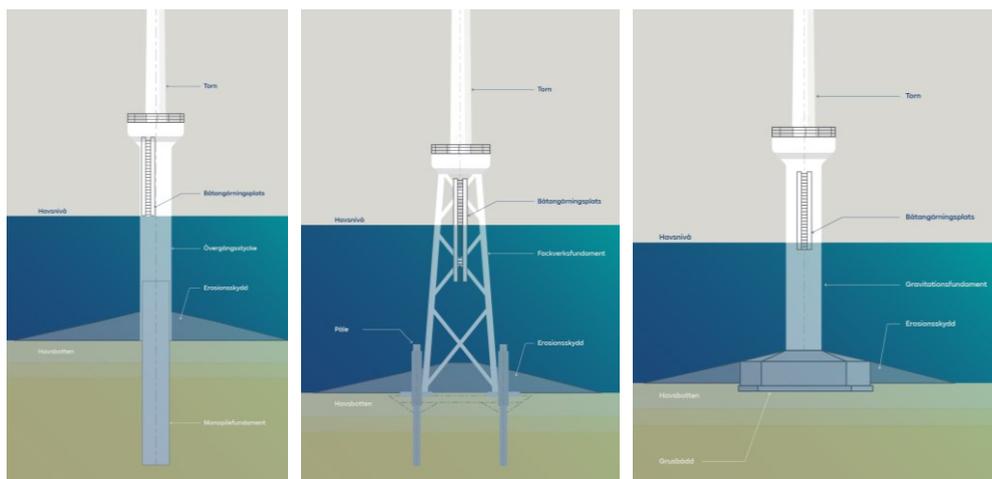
Types of foundations that may be used for the planned wind farm. From left to right; monopile foundations, truss foundations and gravity foundations. (Source: RWE)
